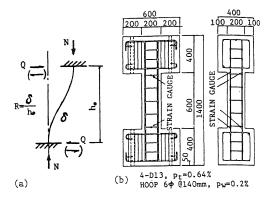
Loading Condition and Outline of Steel Fiber Reinforced Concrete Columns
